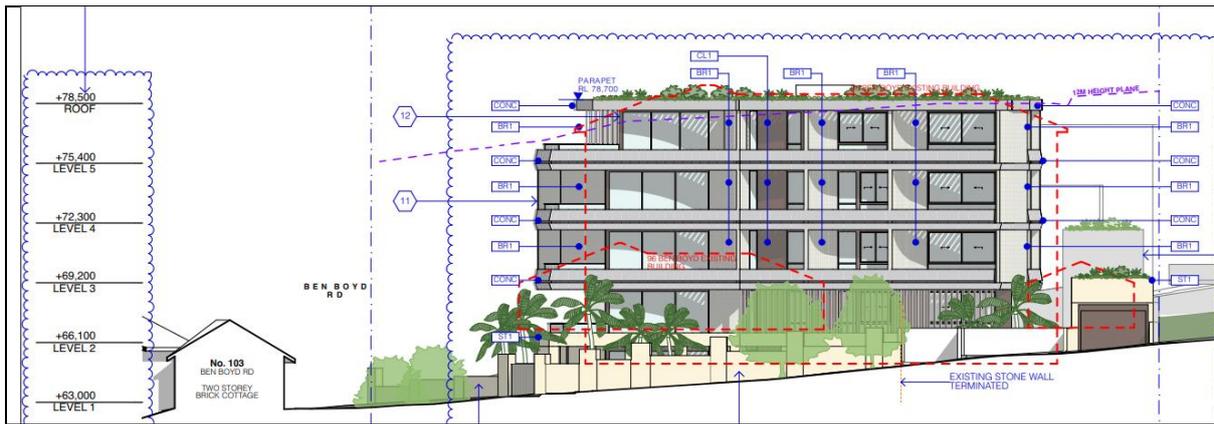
Approved Eastern Elevation, DA 3002 Rev C
